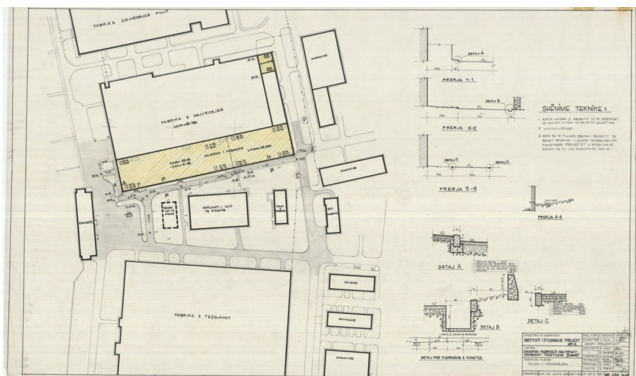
Master plan of the extension of the painting factory (Source – Central Technical Archive – Tirana)
